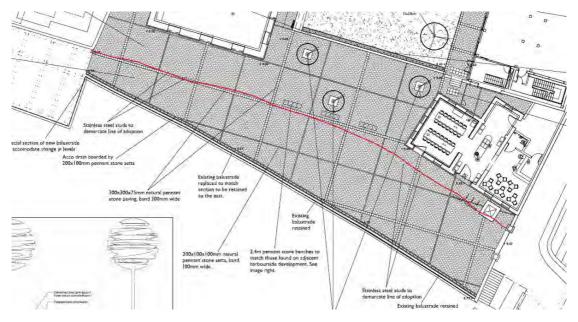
Extract from approved landscape plans for gas works site showing limit of adopted walkway in red
